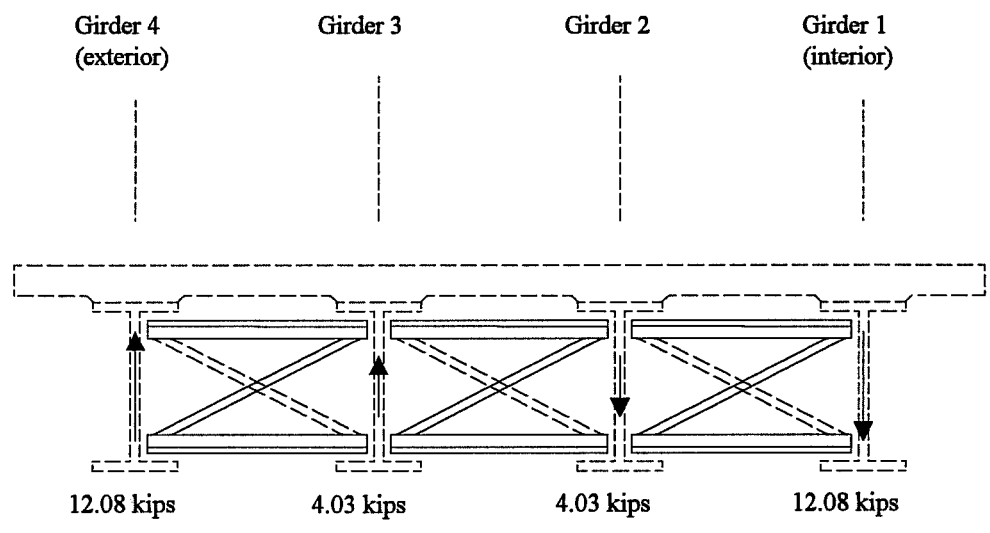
Vertical reactions of the girders on the cross-frames according to the V-load method
